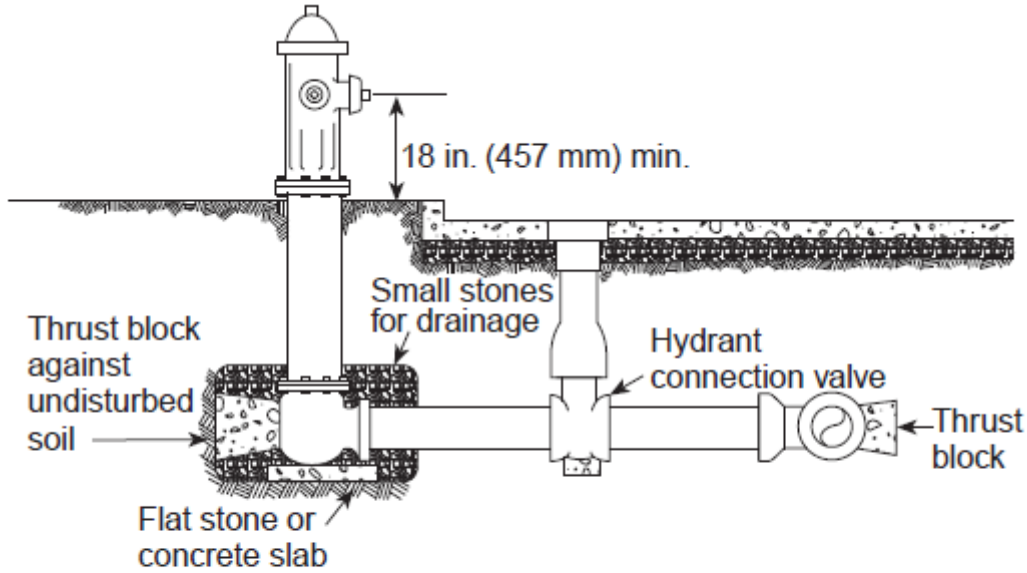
(a) Typical Hydrant Connection with Minimum Height Requirement.
